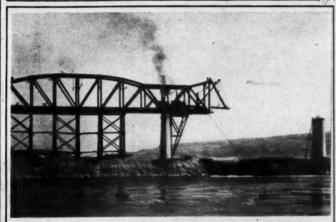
Panoramic Construction View, Showing Part of Elevated Tramway, and Construction Tracks.
